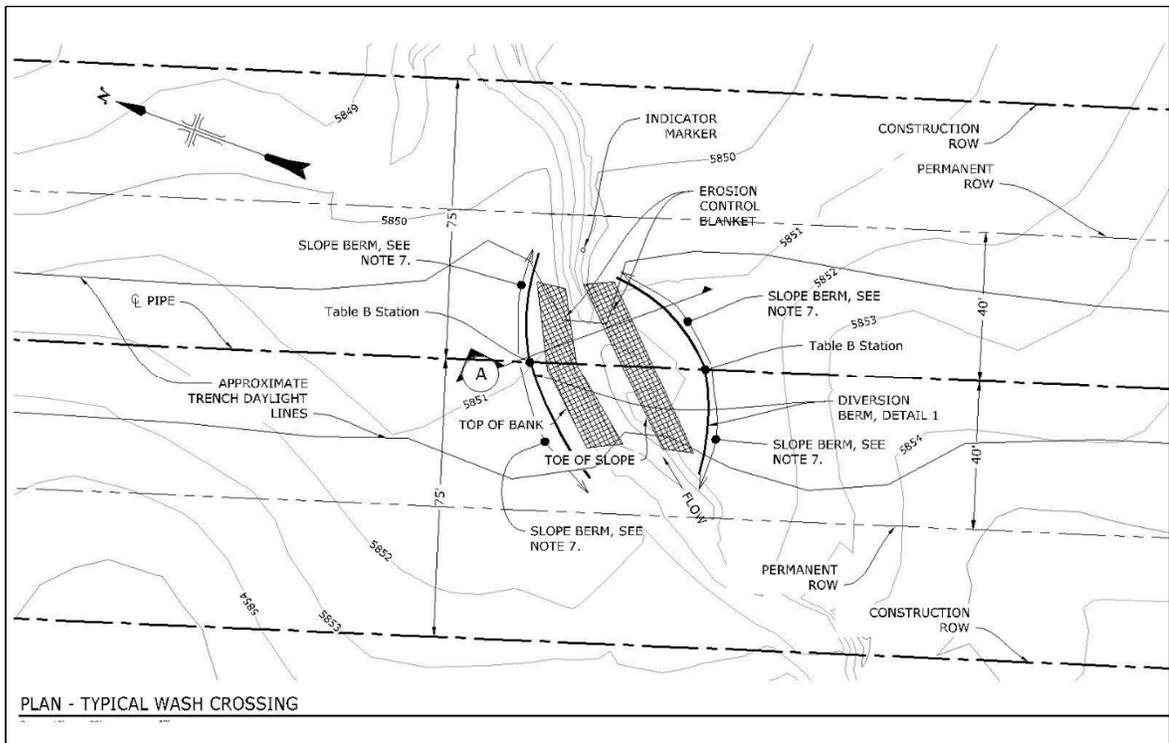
Plan of typical wash crossing for bank slopes flatter than 2.5H:1V.
